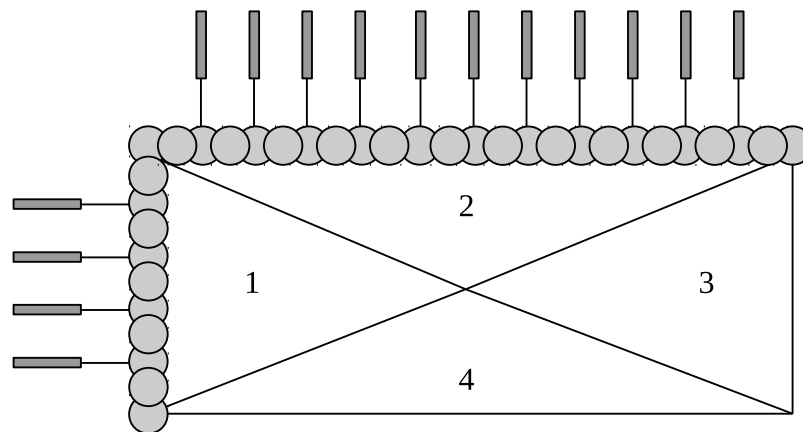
Bored pile wall project example illustration viewed from above. A rectangular pit is to be excavated. To prevent earth from caving in, two sides of the pit have to be secured using anchored bored pile walls.
